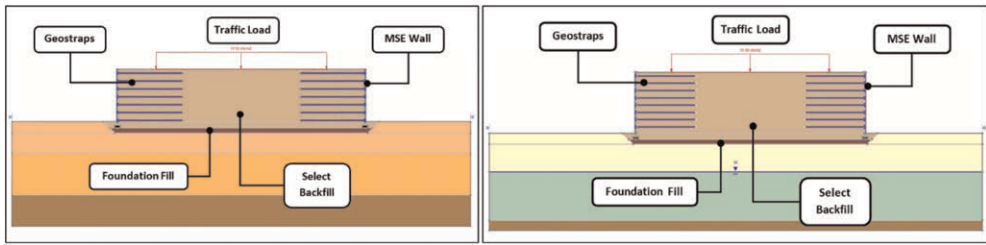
Abutment 1 (left figure) and abutment 2 (right figure) section LEM model.
